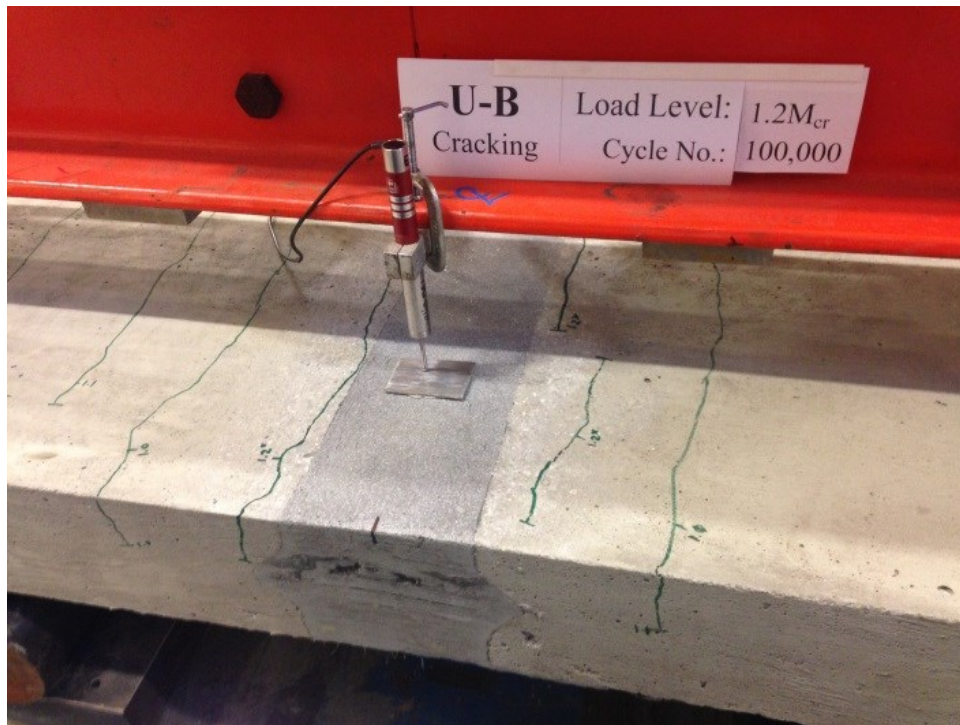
Photo. Observed cracking in specimen U-B after pre-cracking cyclic loading.
